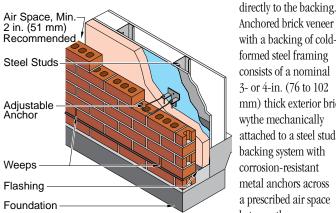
Brick Veneer / Cold-Formed Steel Framing
